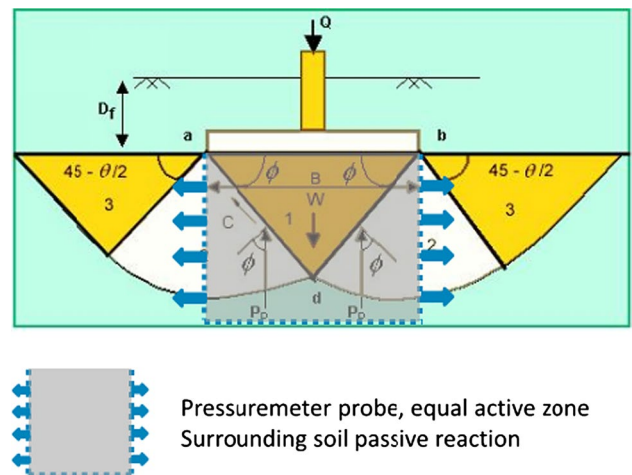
Schematic modeling of shallow foundation failure by Prandtl–Terzaghi and Menard methods [98]
